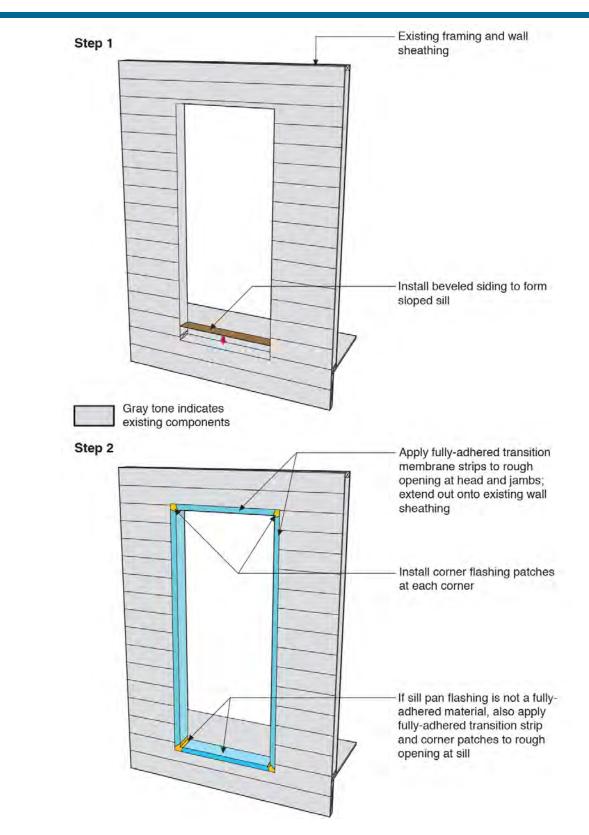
Steps 1 and 2 of installation sequence for new door or reinstalled door in a high performance mineral fiber retrofit wall assembly
